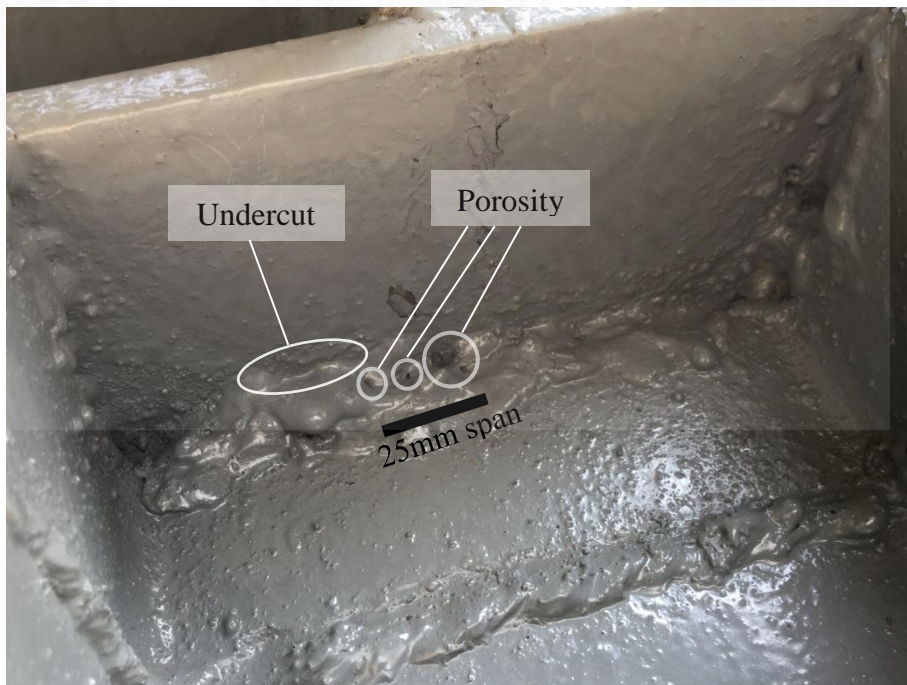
Welding defects on Steel Structure A (joint 4)
